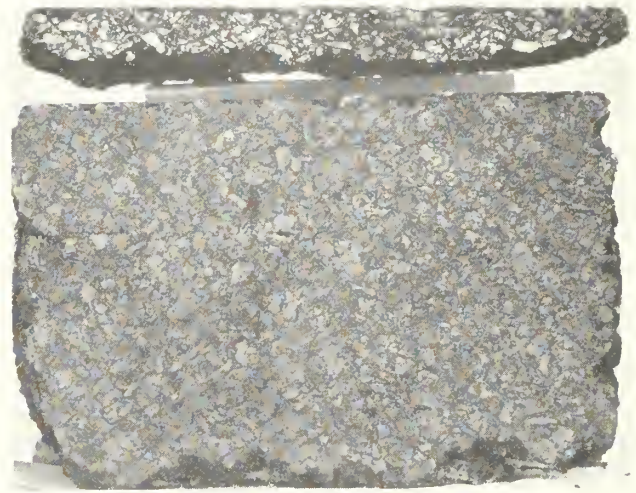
APPEARANCE OF A SAMPLE OF THE SURFACE OF EXPERIMENT 8. THE CRACKS SHOWN WERE CAUSED BY HANDLING THE SAMPLE.
